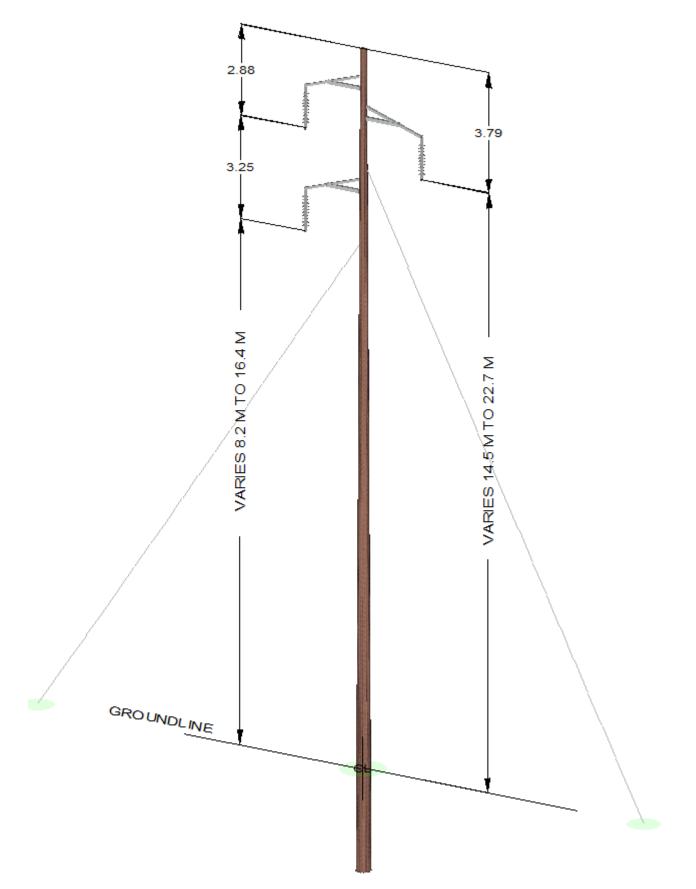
Typical Single-Pole Guyed Suspension Structure
